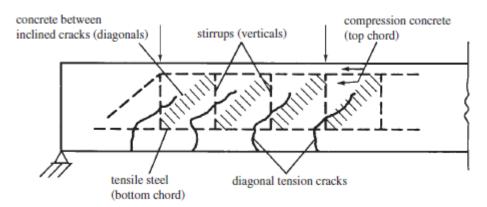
Effect of vertical stirrups to control the diagonal tension cracks
